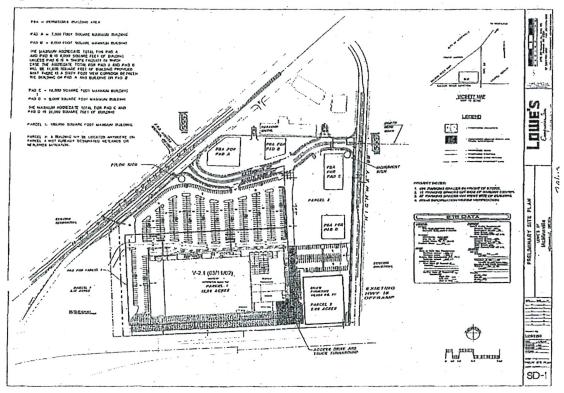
Existing Conditions and Applicant's Proposed Site Plan/Amendment to Master Plan
